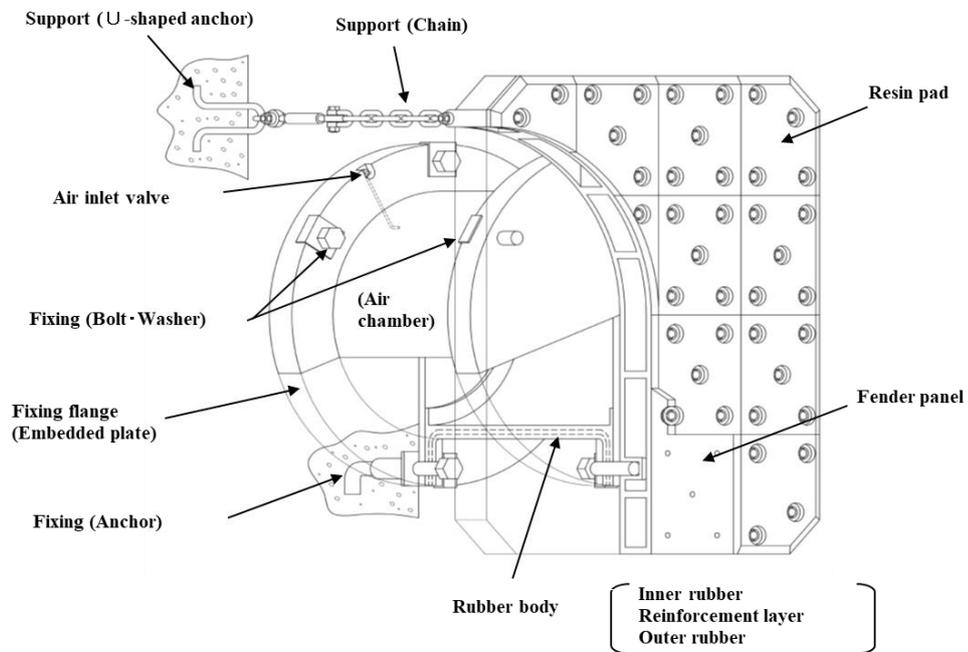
Configuration of fixed-type pneumatic fender
